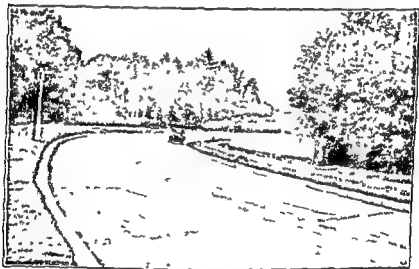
SUPER ELEVATION ON ROAD NEAR LONDON
